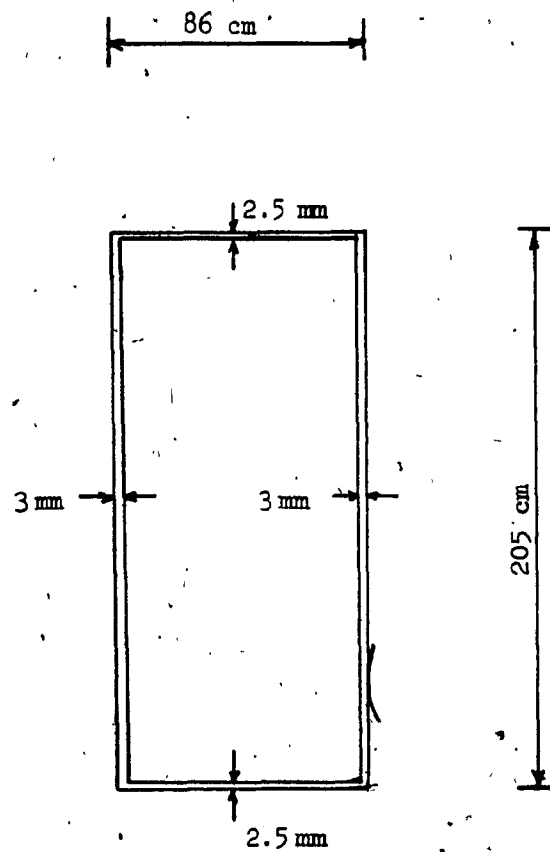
Maximum Gaps Between Frame and Door Specimen.
